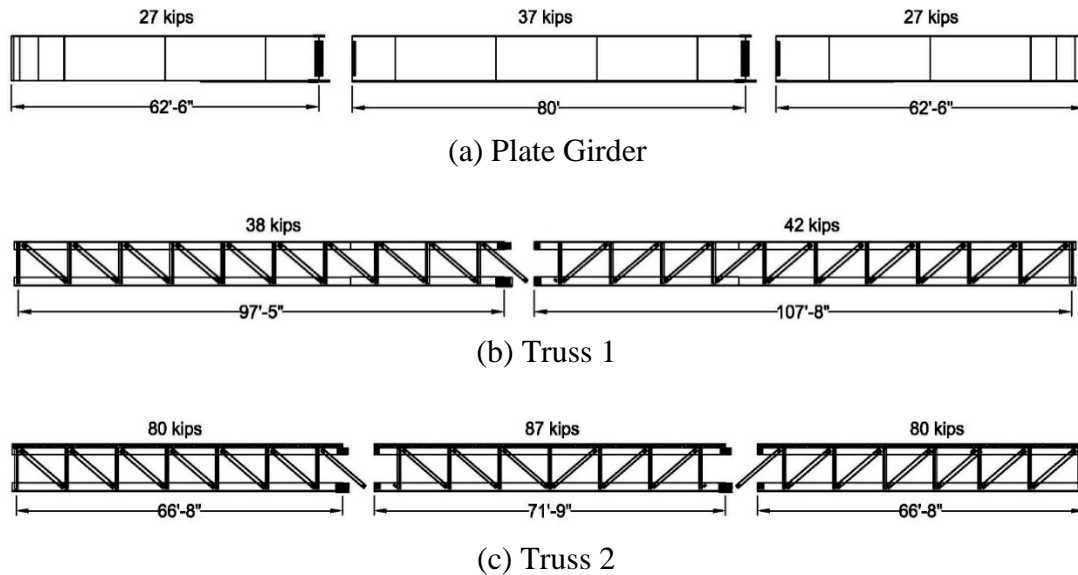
Weight of each Splice Section for the (a) Plate Girder, (b) Truss 1 and (c) Truss 2
